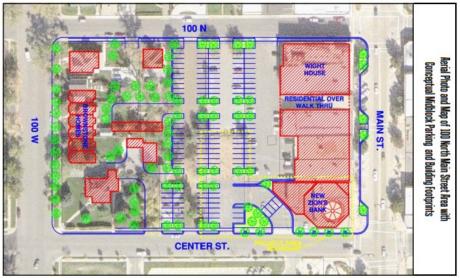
Bountiful City 2009 General Plan - Downtown Master Plan - Page 2
